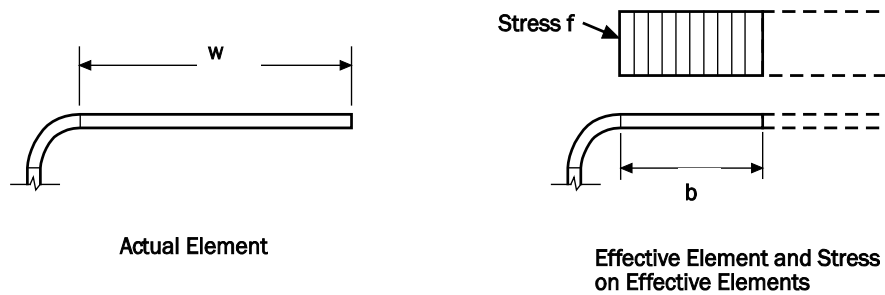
Unstiffened Element With Uniform Compression
